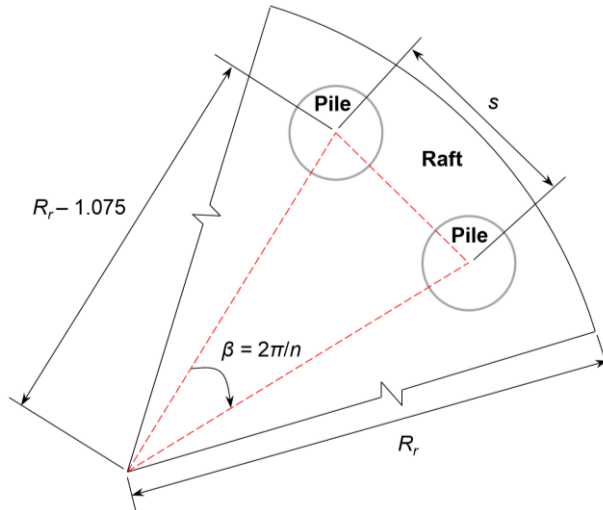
Pile-raft foundation segment – pile spacing calculation
